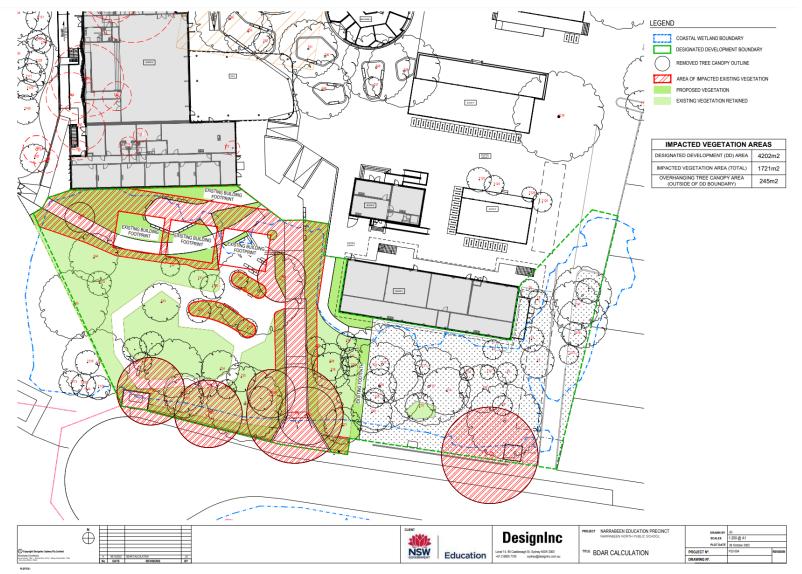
Proposed development plan (ADE Consulting Group 2022)
